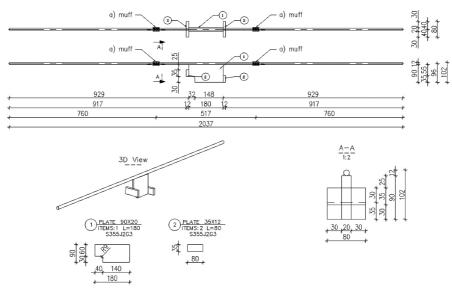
The geometry of balcony connection: in Stage I (without muff) – set I\_ZB\_1\_1 and in Stage II (with muff – element a)): II\_ZB\_1\_2 and II\_ZB\_1\_3
